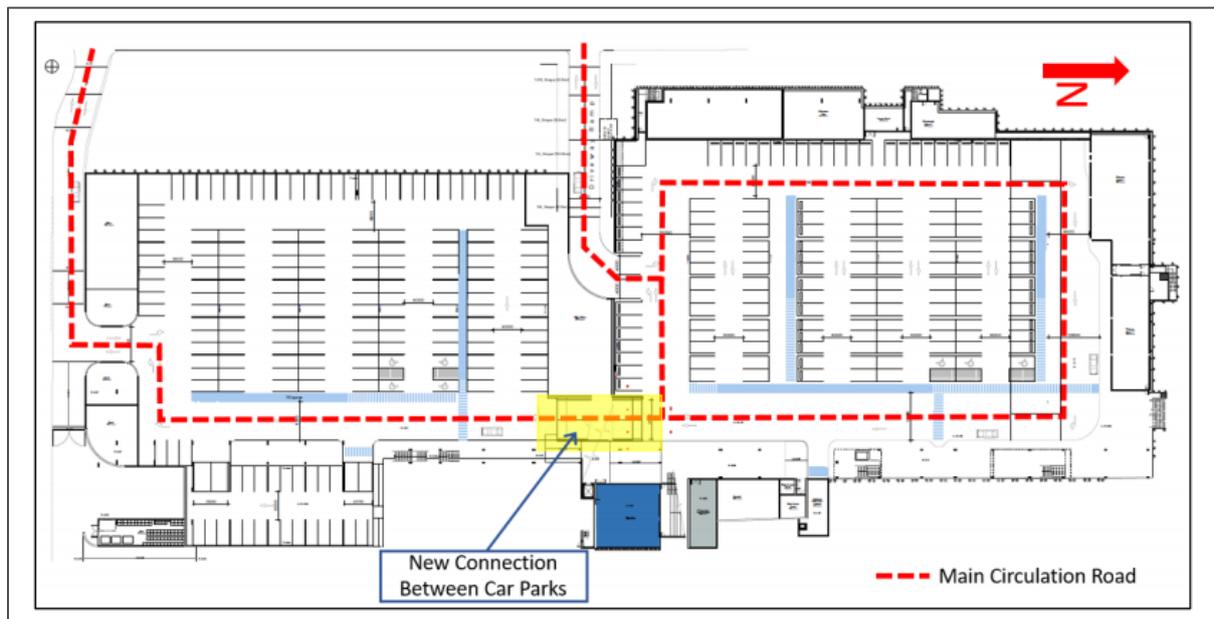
| Layout of proposed underground car park with access from Victoria Street and new connection between the car parks (Source: Applicant's EIS 2020)
